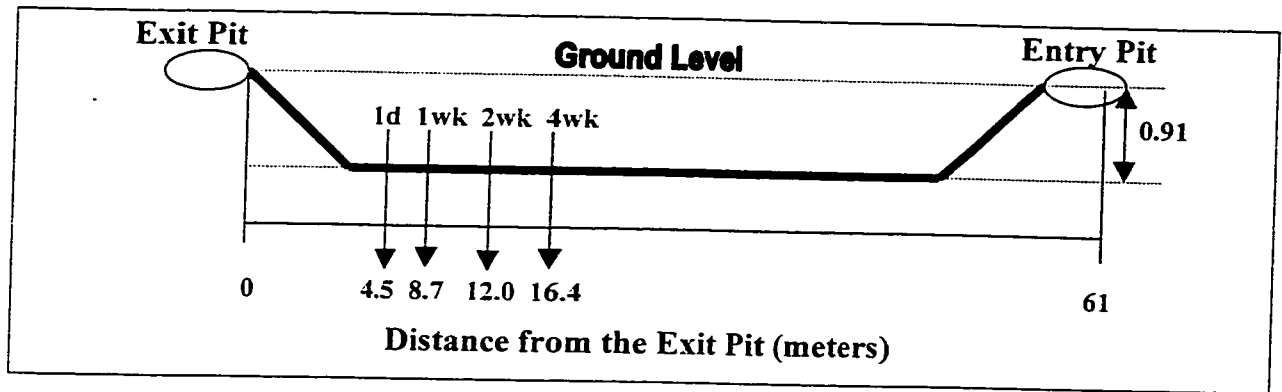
Elevation View of 200mm Pipe Installation in Clay
